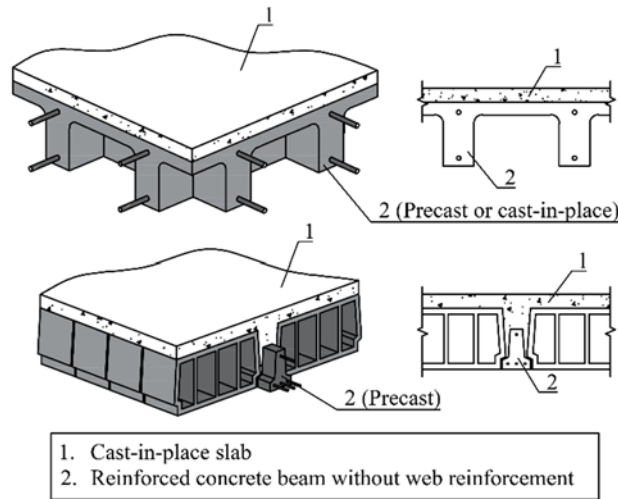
Examples of structural elements compound of a reinforced concrete beam without web reinforcement and a cast-in-place slab.
